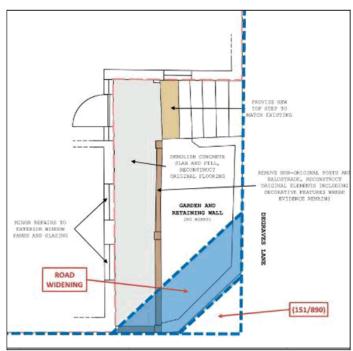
Plan showing works within the road reserve (Port Arthur Historic Sites, 2020)
